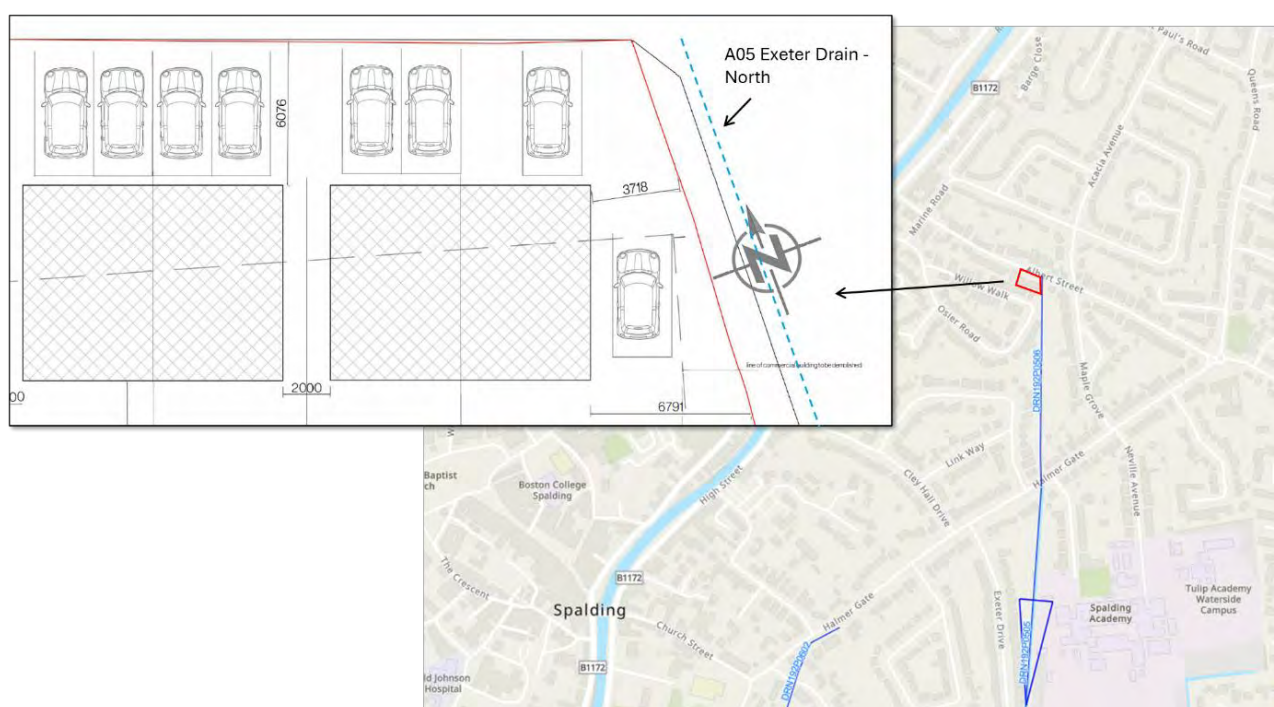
Location plan and site plan showing proposed residential dwellings 'Planning (Street Scene, Block and Location Plans) 25/67 4/PA/010A' (Tac Architects 11/11/2025).
